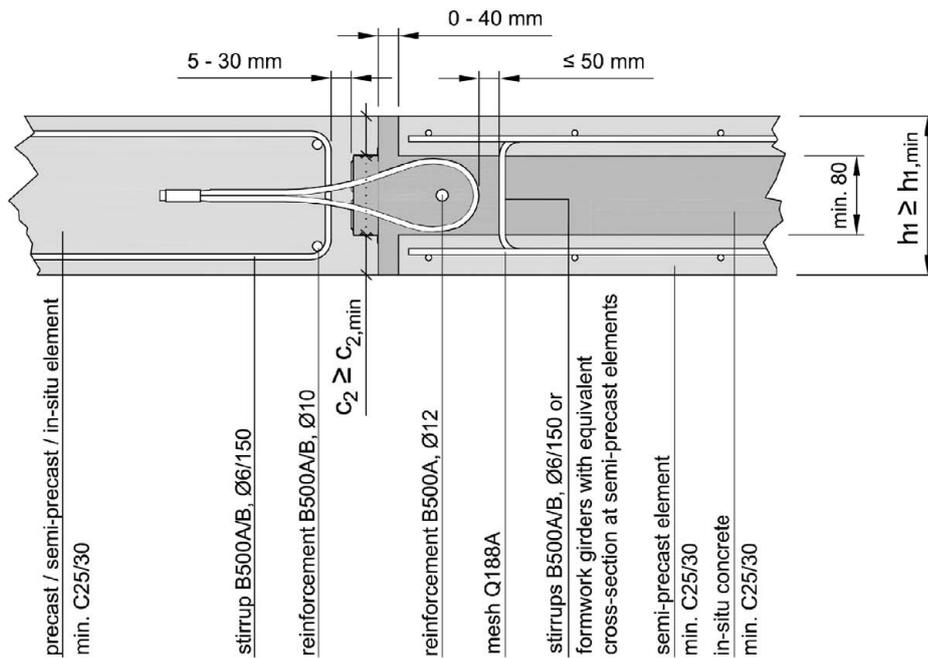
Standard detail (cross section) with precast/semi-precast concrete supplement, reinforcement
